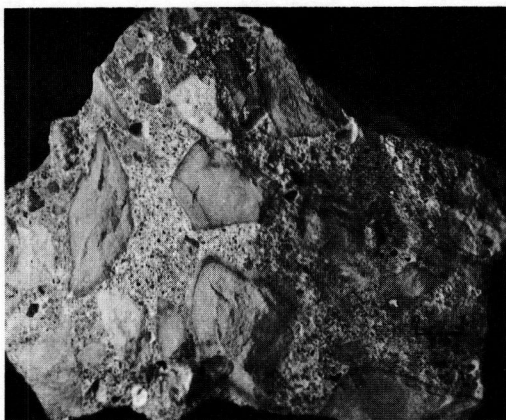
A piece of distressed concrete with reaction rims taken from a salvage pile along Highway 218 south of Waterloo.
